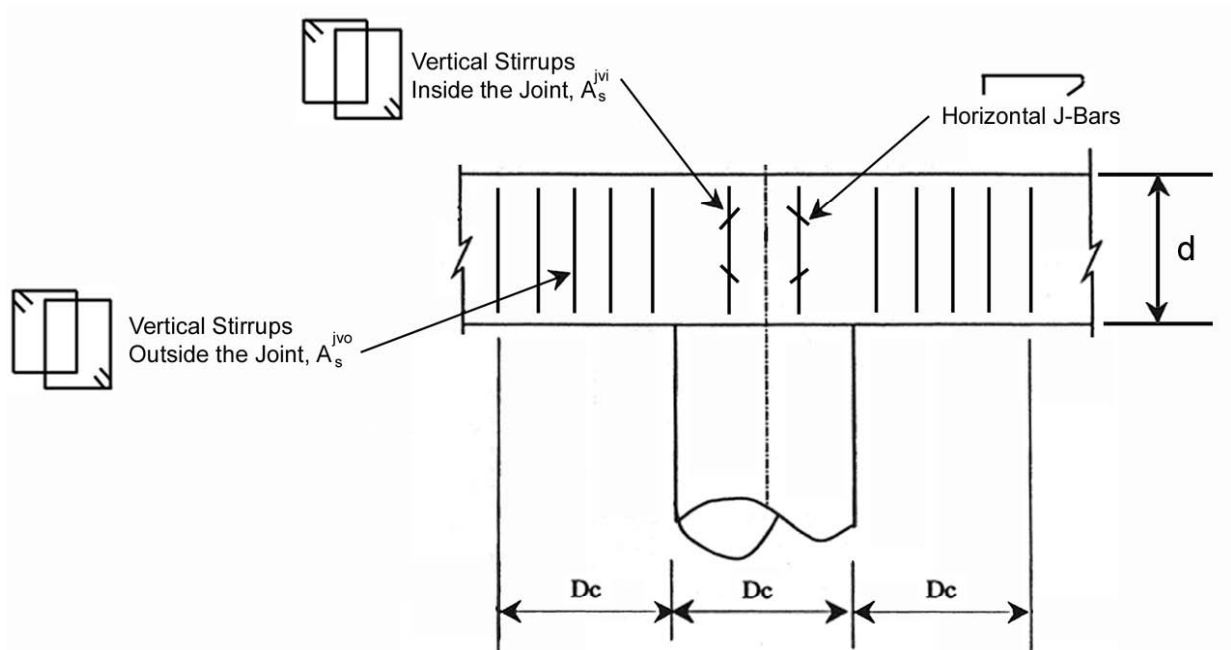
Location of Vertical Joint Shear Reinforcement
